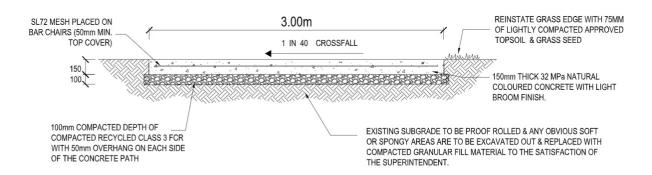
Typical proposed path construction detail. (Source: Civil Road Solutions Pty Ltd, Yan Yean Pipe Track, A13293, A13294, A13295, A13296, A13297, dated 7–29 November 2019 and 25 March 2020)
